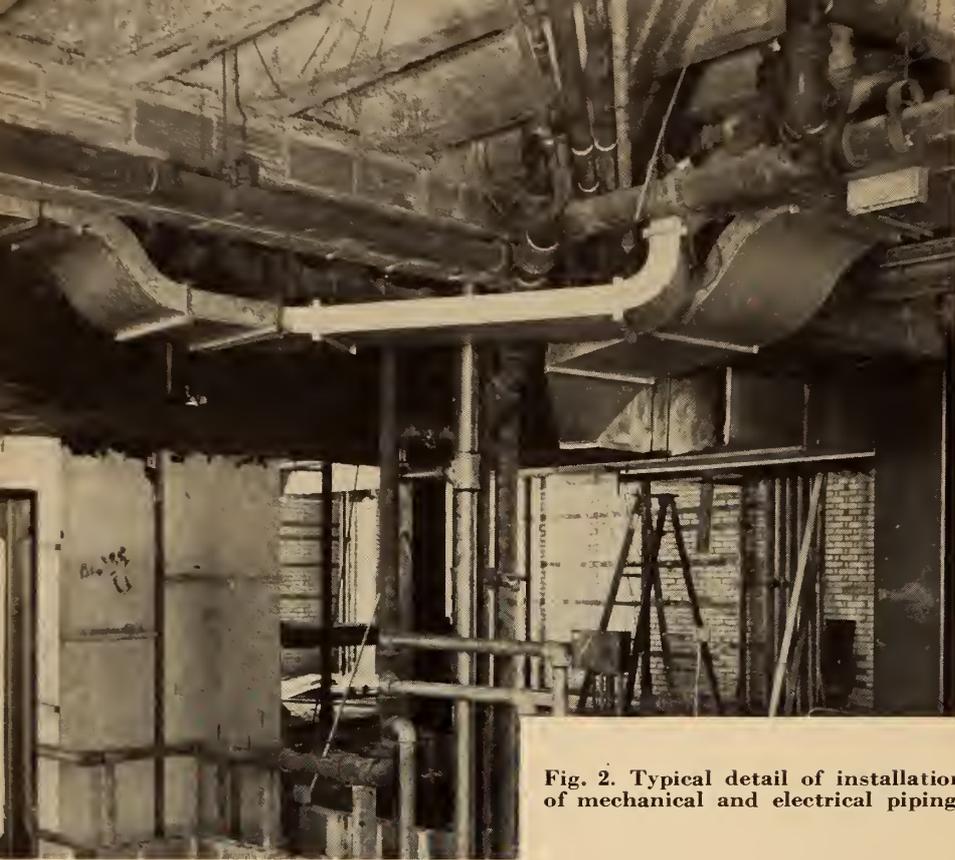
Typical detail of installation of mechanical and electrical piping.
